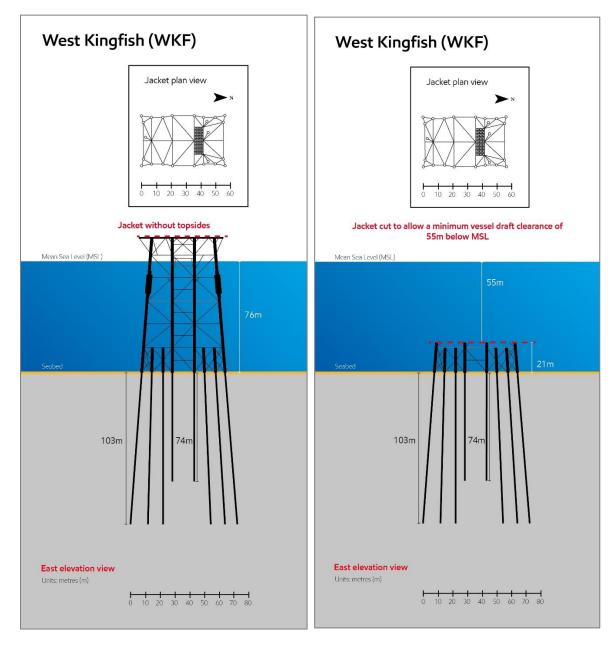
West Kingfish Steel Piled Jacket without topsides (left) and under proposed end state (right)
